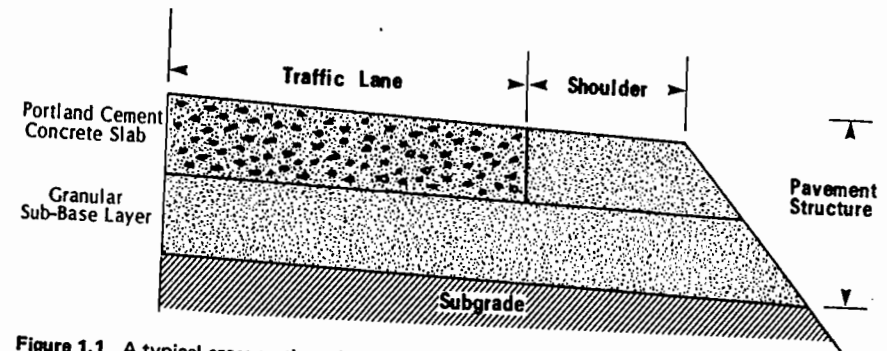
A typical cross section of any of the four basic types of rigid pavements.
